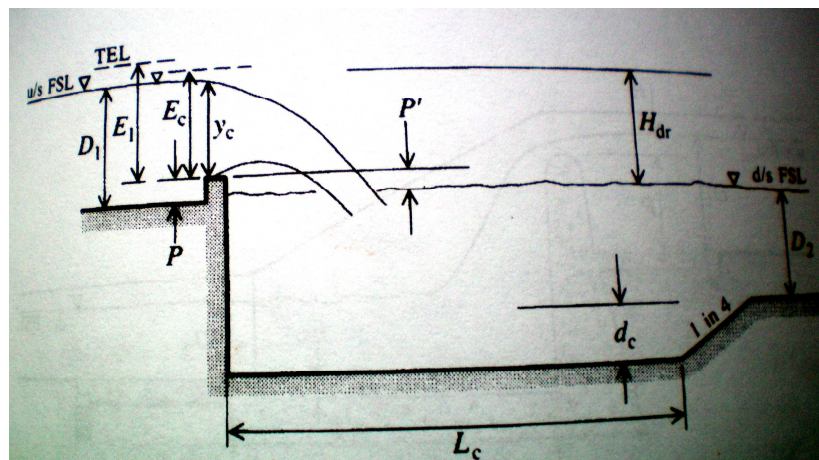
Typical cross sectional profile of a drop structure showing the different design parameters
